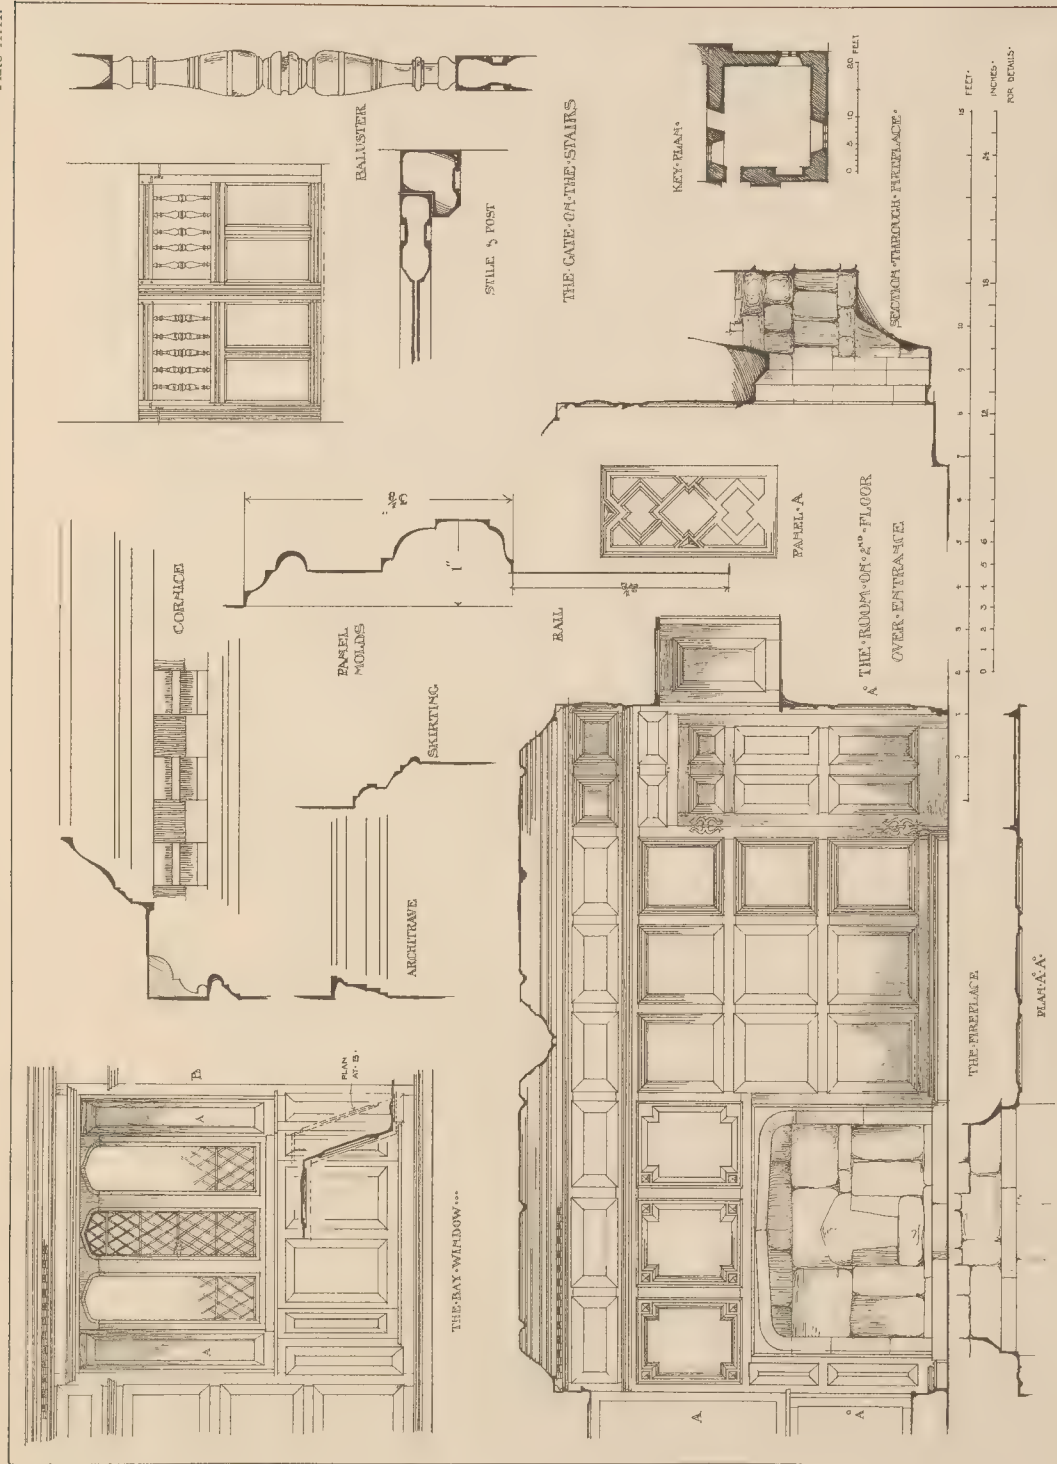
DETAILS FROM CANTERBURY, HADDON HALL, ETC.
